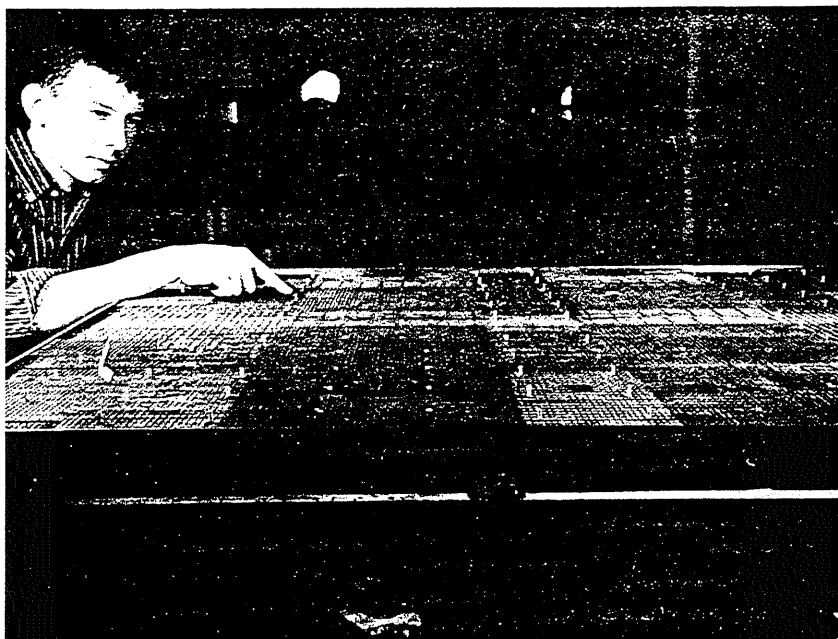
VIEW OF THE REINFORCEMENT IN PLACE
